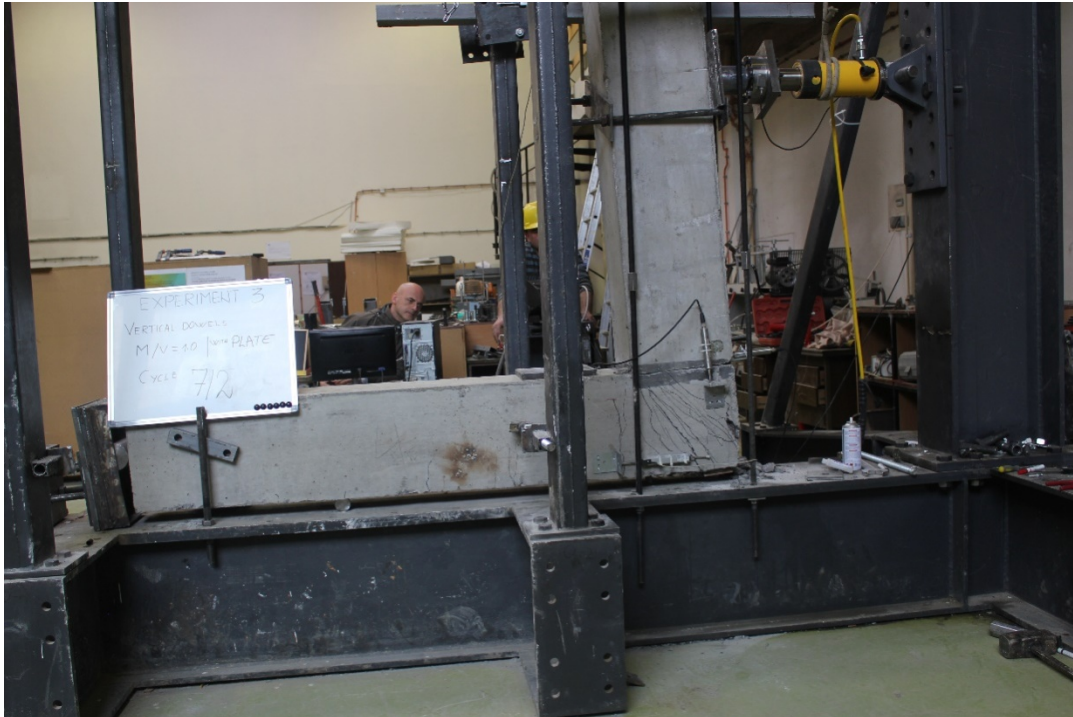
Crack pattern of the specimen under the last loading cycle - photo from the experiment on specimen "S.3 V.D."
